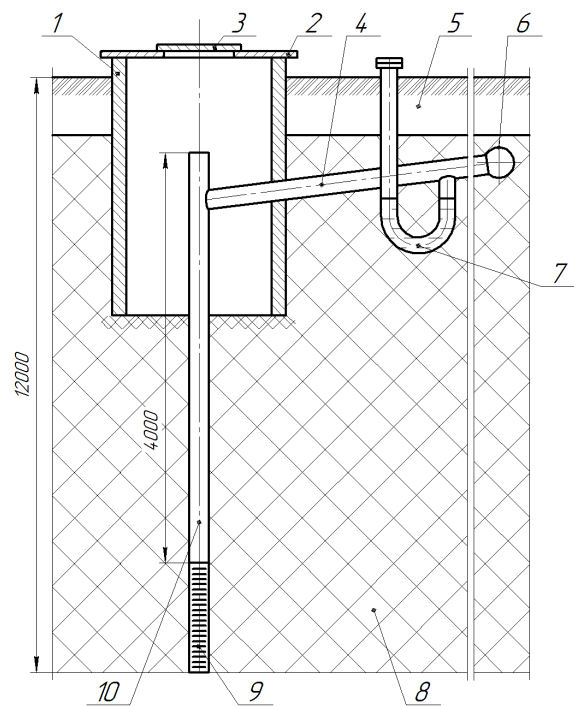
Scheme of the degassing well: 1 – reinforced concrete base of the well; 2 – hatch; 3 – manhole cover; 4 – withdrawable tube; 5 – embankment for insulation; 6 – collector pipe; 7 – node for diverting excess water; 8 – body of the landfill; 9 – filter; 10 – filter column
